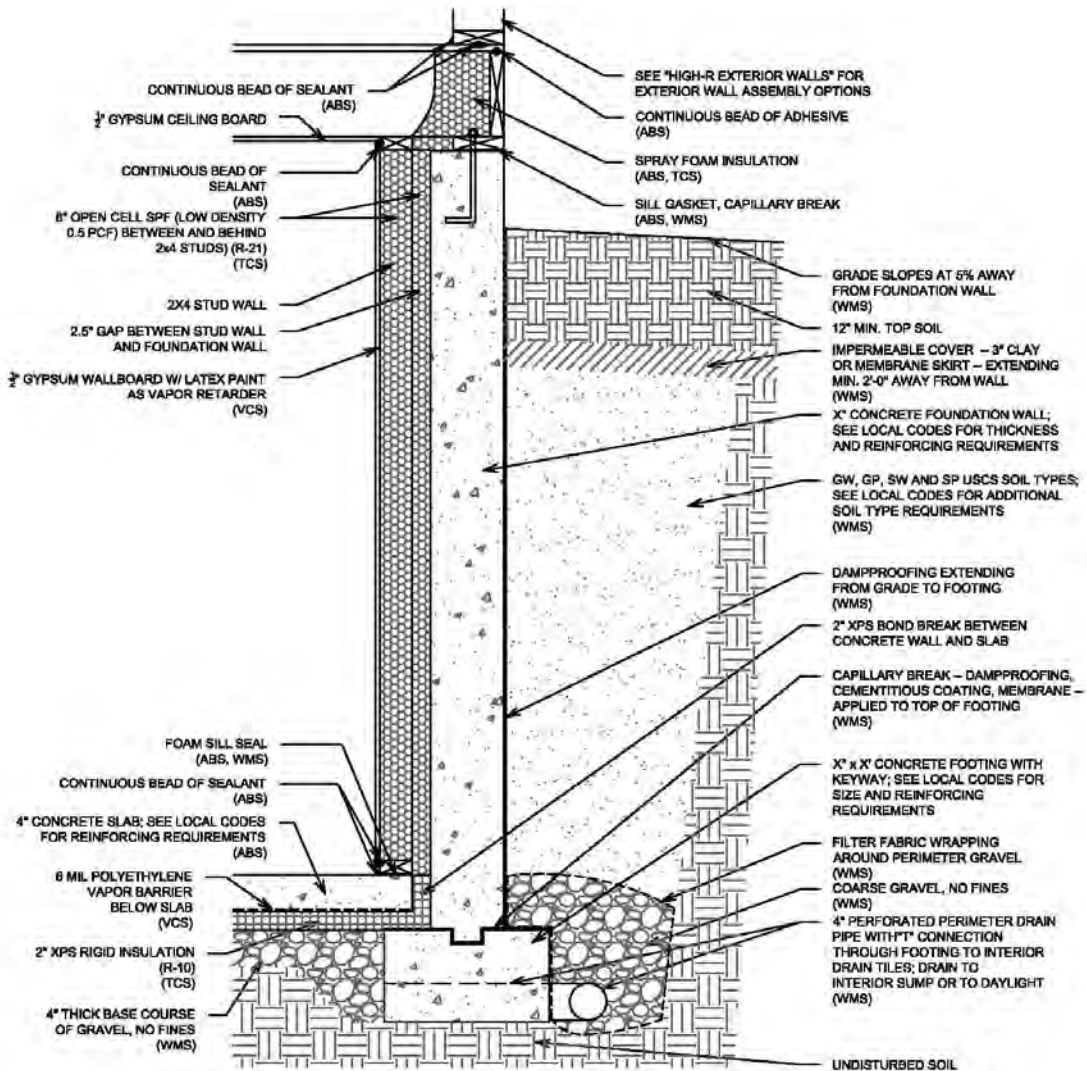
Case 10 Detailed Drawing – Recommended Foundation Wall System
